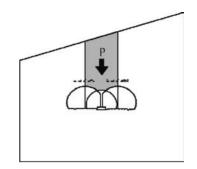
The load acting on pillar of 2-Arch tunnel in soil and weathered rocks (Matsuda, 1998).
